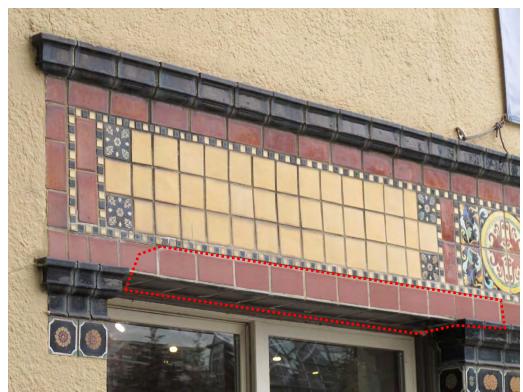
East elevation, detail of tile. Red and black header tiles replaced during 1996-2002 repairs and renovations are identified by dotted line (original tiles are darker in hue and have a more reflective surface). Such repairs occurred at each window header of this part of the elevation.
